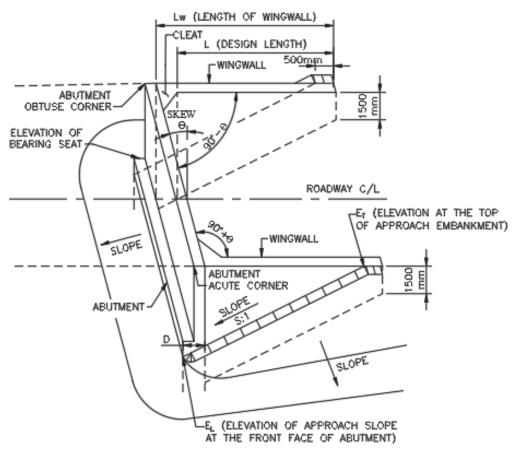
Geometry of U shape bridge wingwall parallel to roadway
